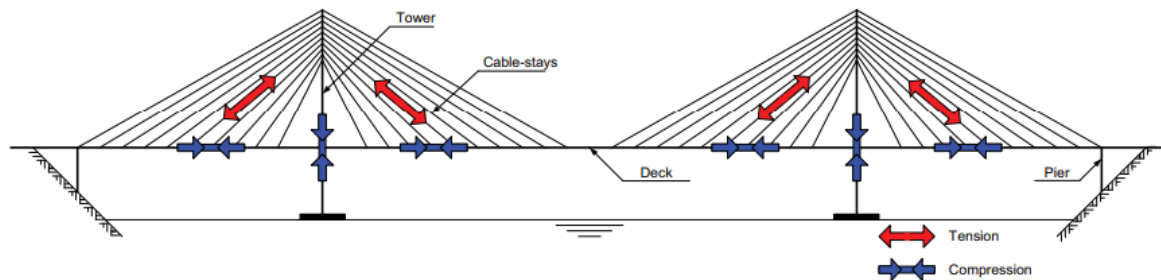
Scheme of load transfer in a cable-stayed bridge [11]
